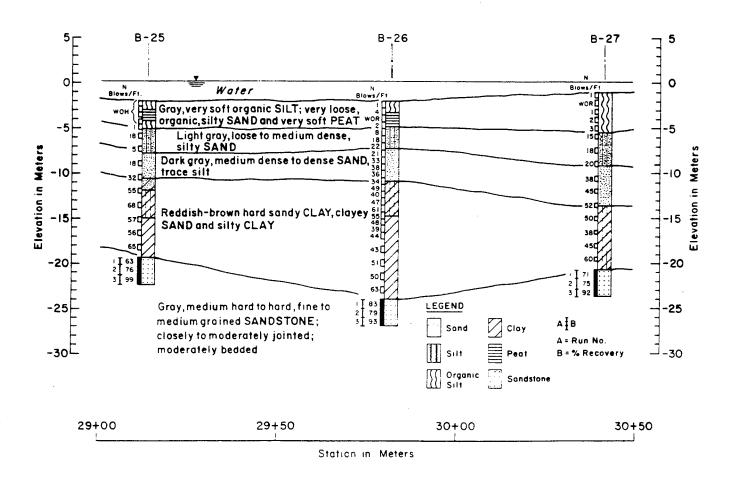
Typical Subsurface Profile. (Lowe and Zaccheo, 1991)
